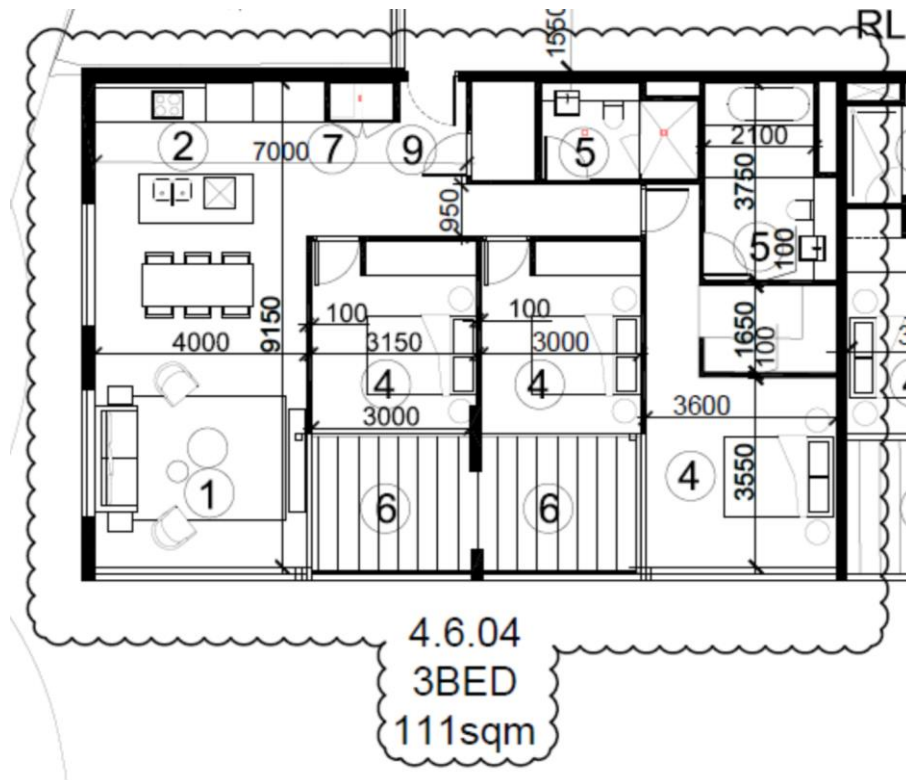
Excerpt of plans, demonstrating typical apartment conversion
